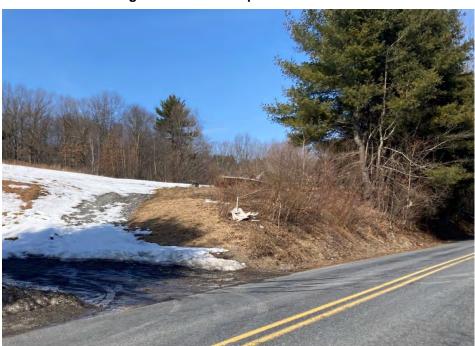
Existing Area and Area Downgradient Proposed Subsurface Infiltration Beds
